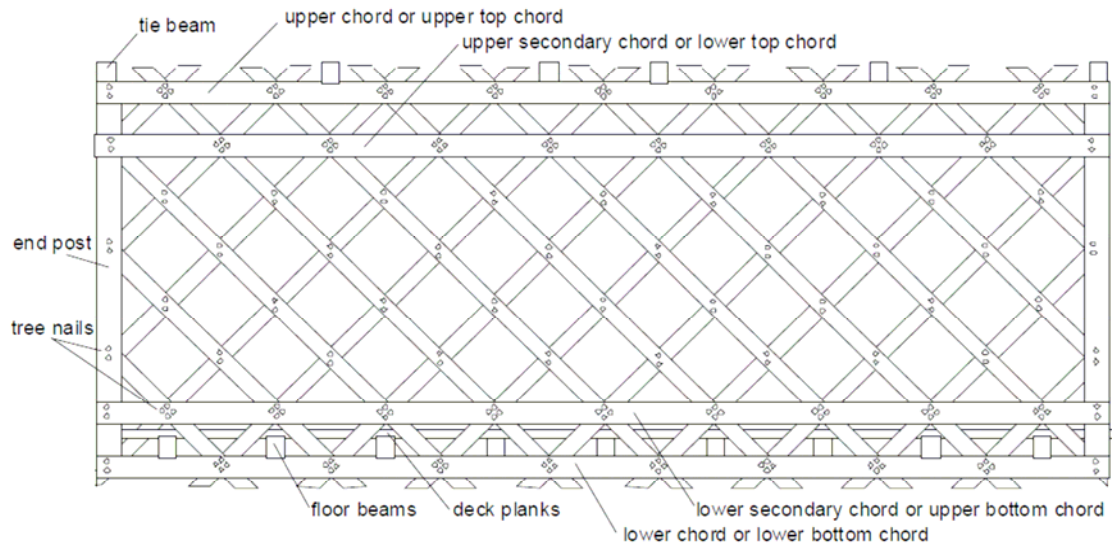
Labeled schematic of Town lattice truss (Pierce et al. 2005)
